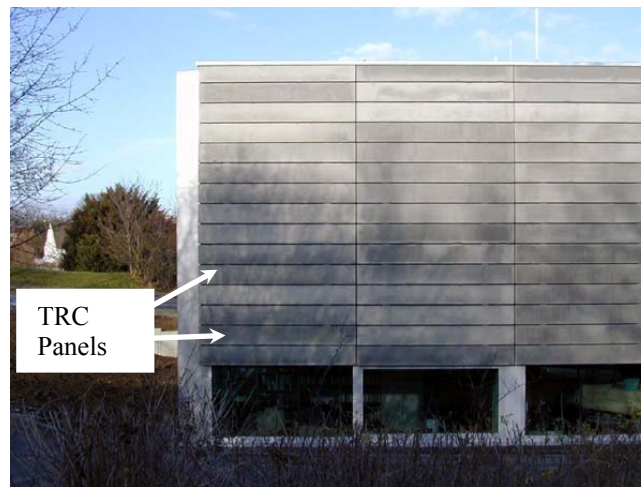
Facade of the extension of the testing hall of the Institute of Structural Concrete, Aachen University, Germany (Hegger and Voss, 2008)
